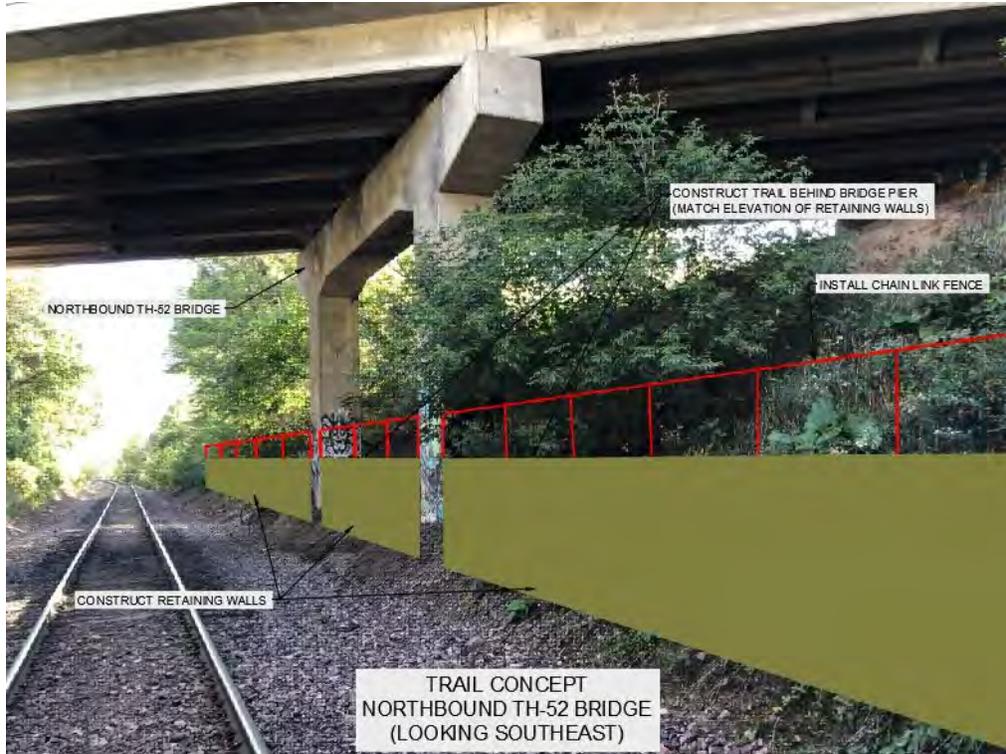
Rendering Concept at Northbound TH-52 Bridge
